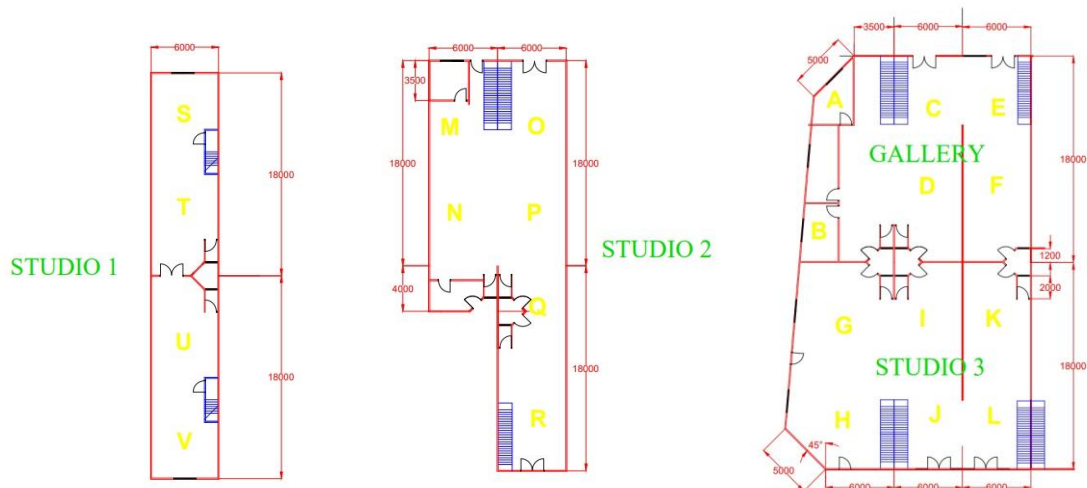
Drawing plan of each studios in Kampus Bandar building
